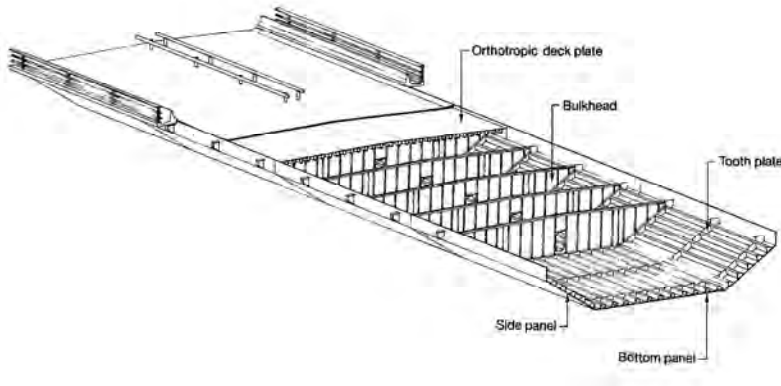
Box girder, structural principle. Bulkheads every 4 m.
